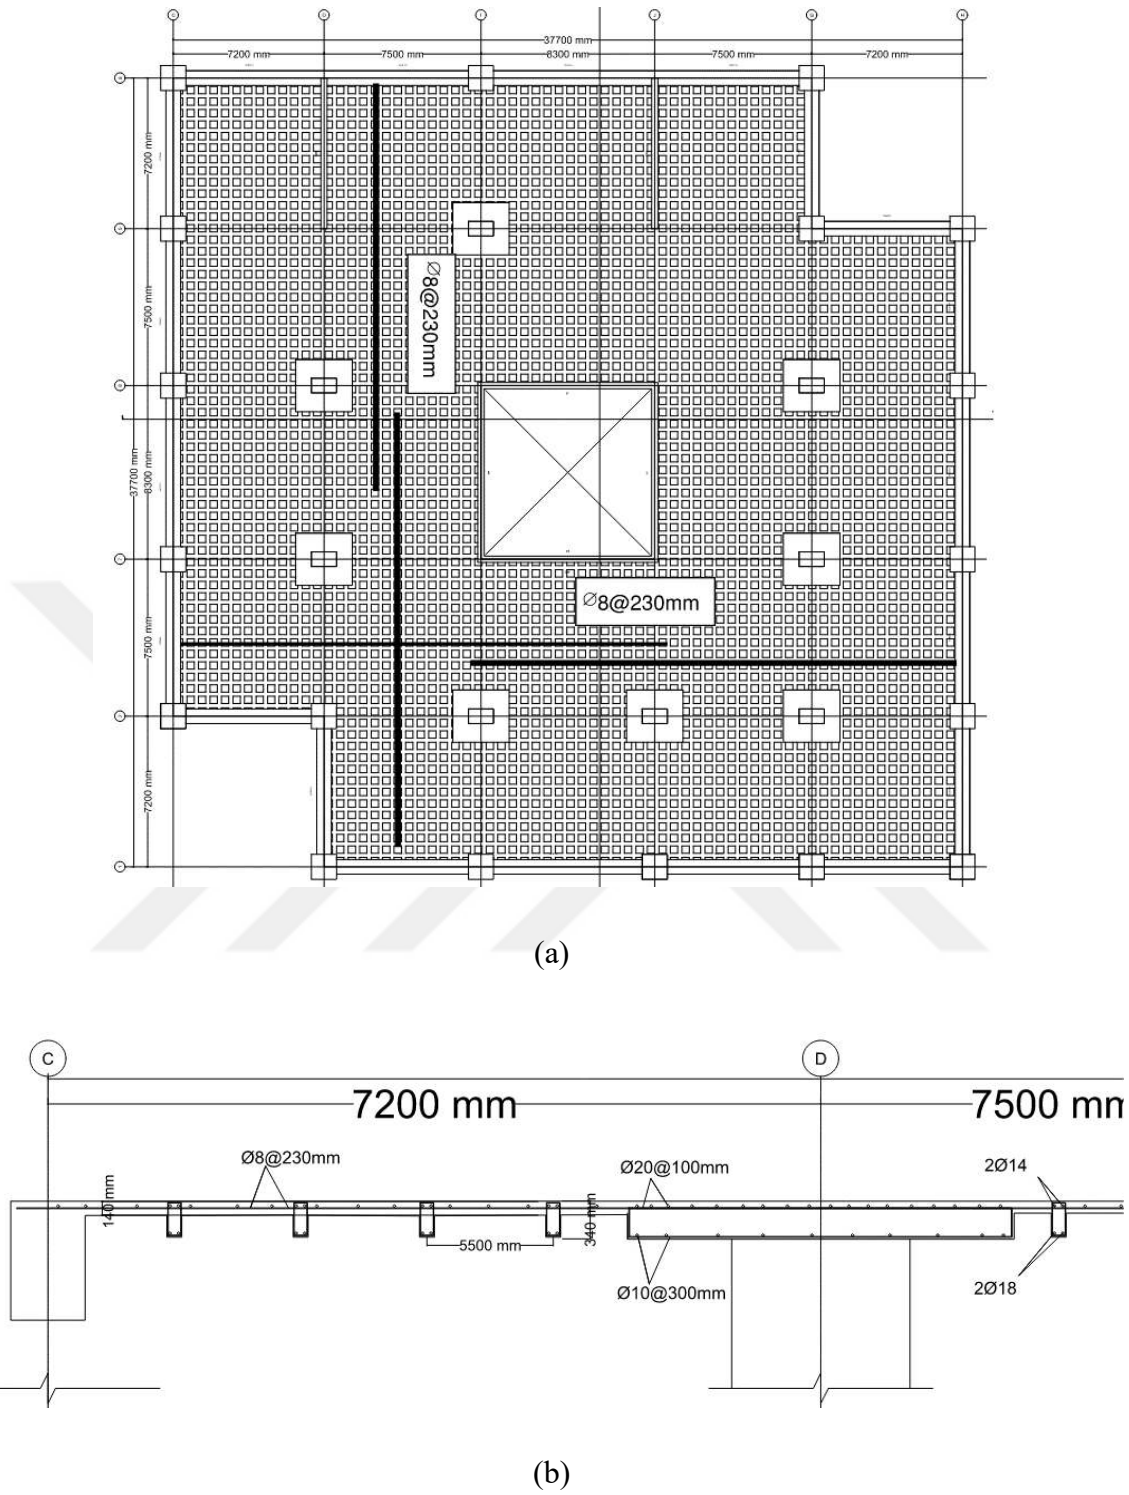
(a) Steel Reinforcement for Panel (8.3-7.5-7.2) for Waffle Floor (b) Section A Showing Steel Waffle Floor for Model (8.3-7.5-7.2).
